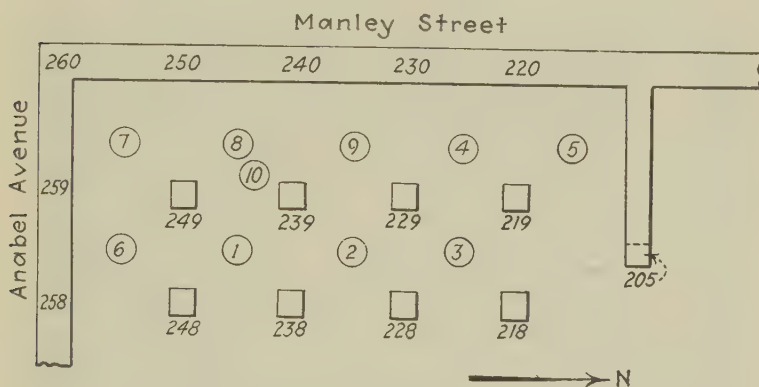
FLOOR PLAN SHOWING LOCATION OF TEST PANELS, MACY WAREHOUSE.
